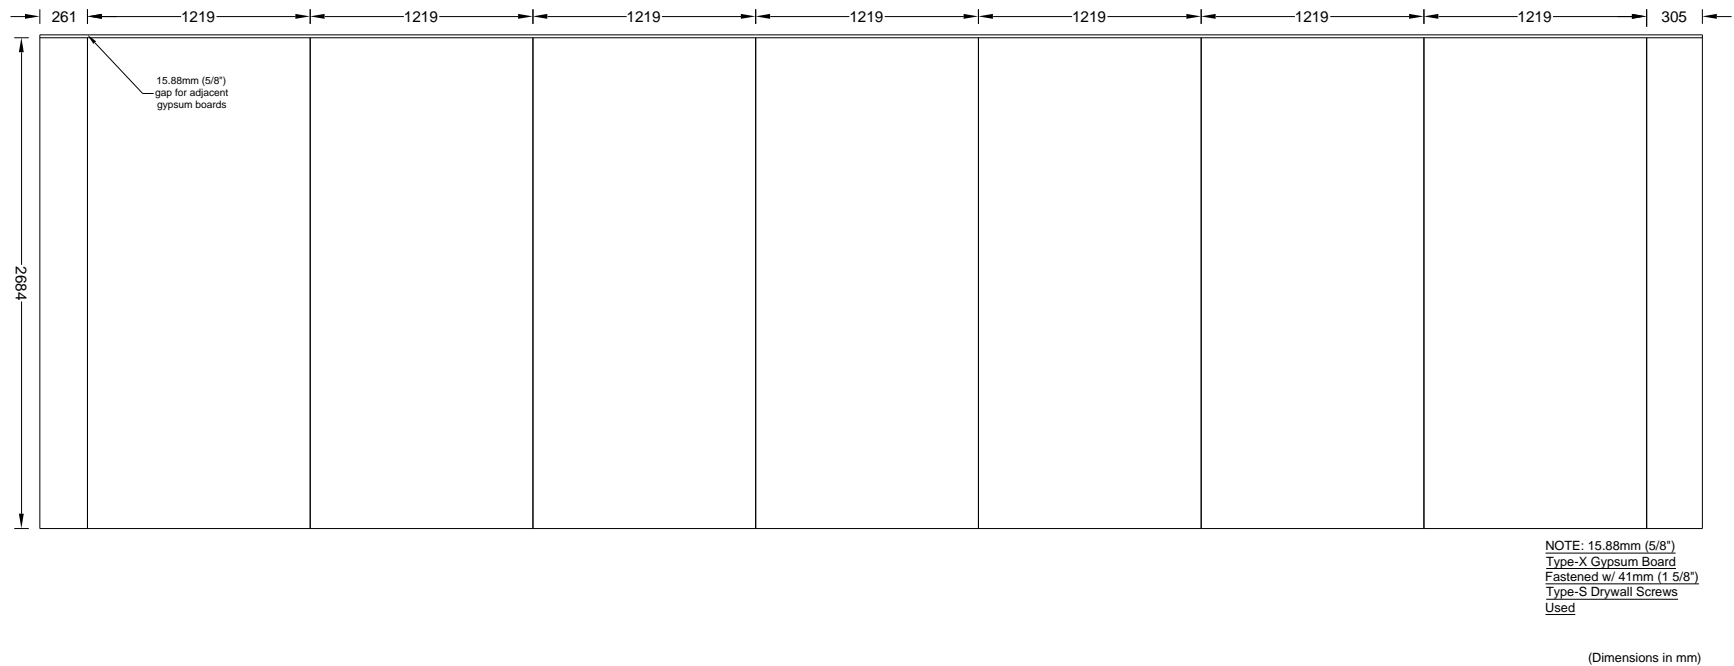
Test 1-2 Large Compartment CLT - W1 - Gypsum Layout - Base Layer
